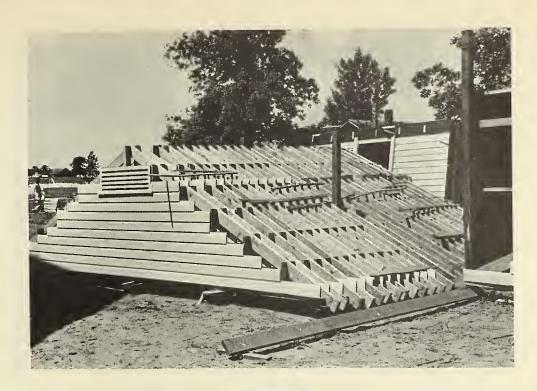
A HOUSE - GABLE END PANEL STORAGE F.S.A. PHOTOGRAPH 11470M4 - LEE
